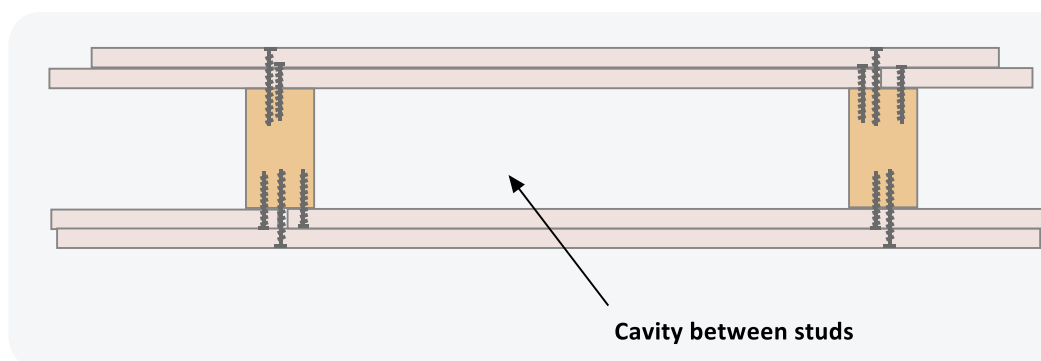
Horizontal section through typical FRL90/90/90:RISF45: NC timber stud wall.
